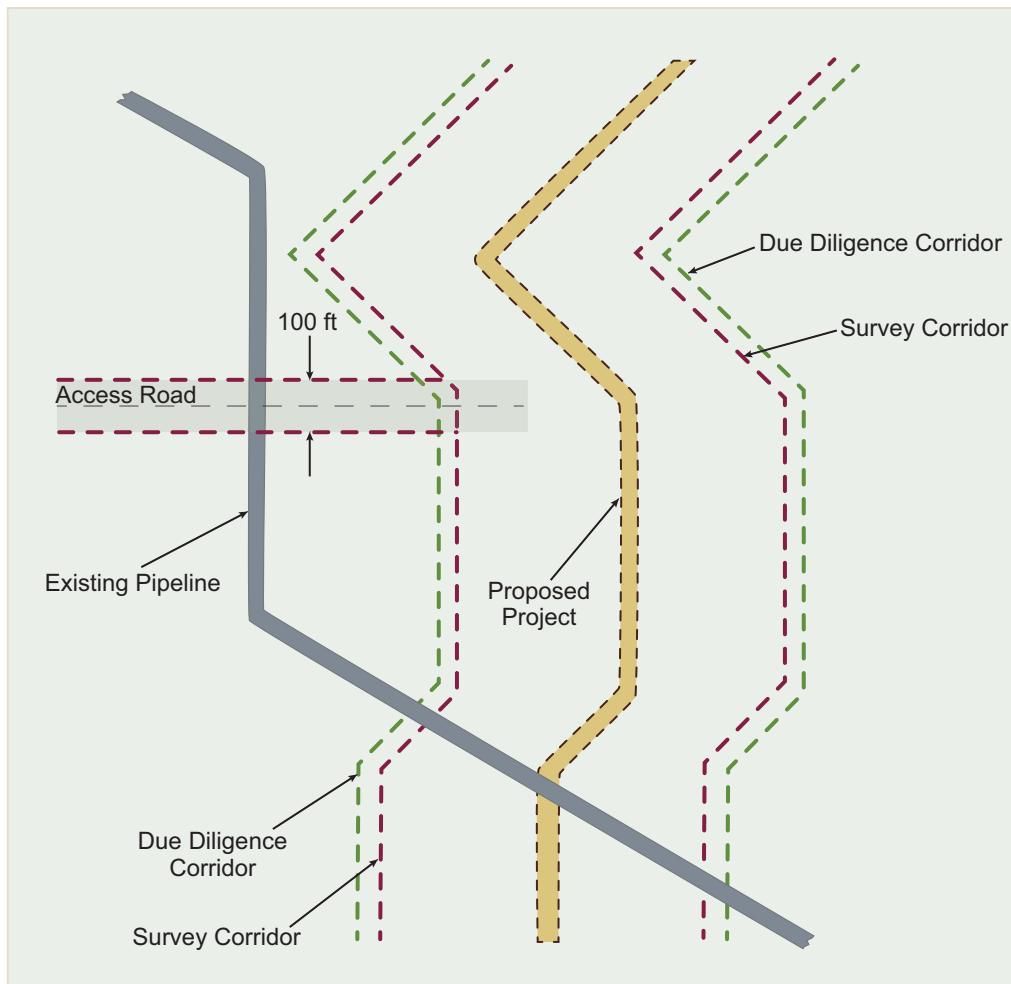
An Access Road in the Vicinity of the Existing and Proposed Pipeline
